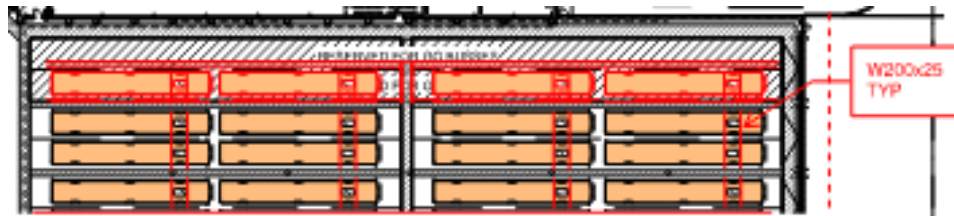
Roof Framing Plan – Structural Support for Interior Pantographs.
